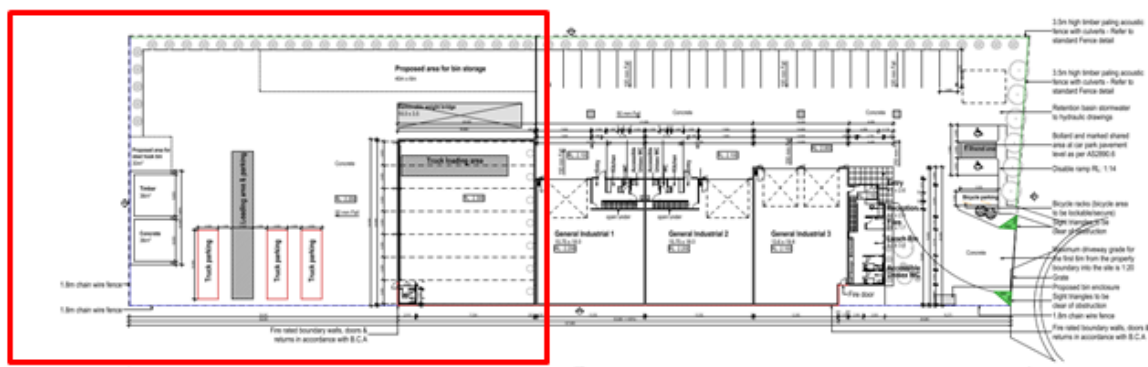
Proposed layout plan with WRTS at rear of the site and general industry units at front
